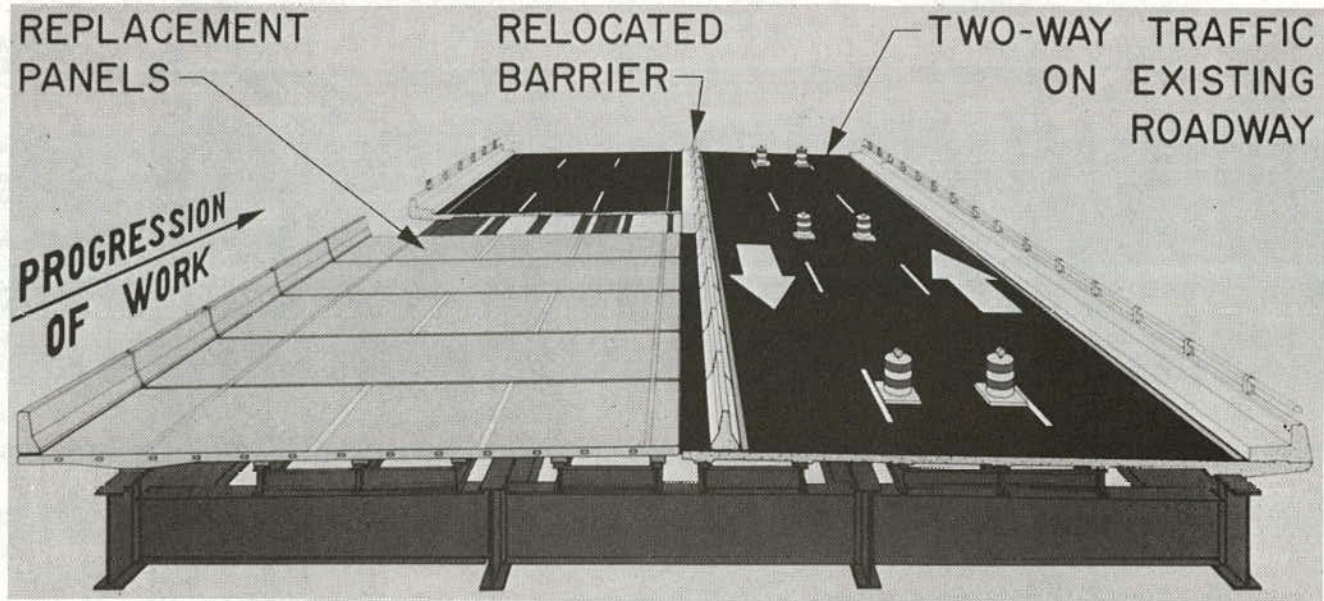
Precast post-tensioned lightweight concrete panels were installed at night to replace the deck of the Woodrow Wilson Bridge (23).
